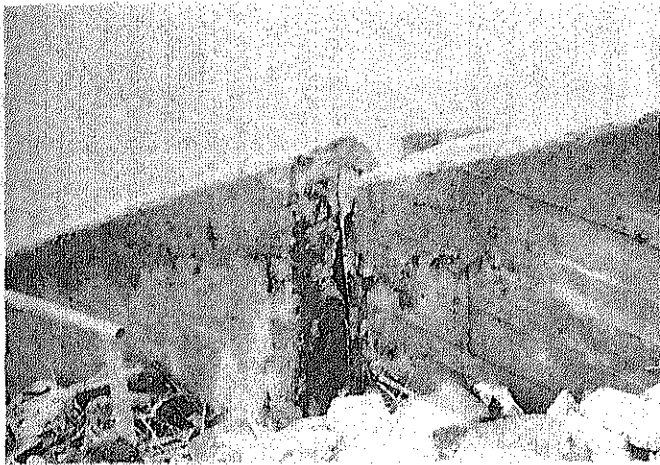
Damage to the retaining wall of the Ambuklao Dam
